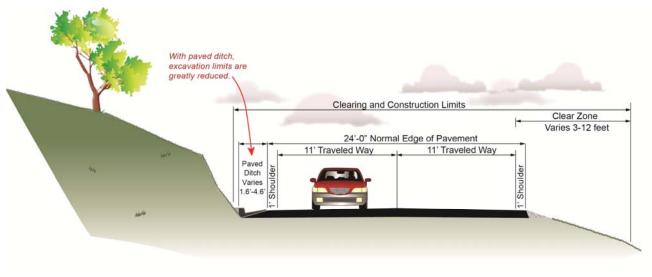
Typical Section at Steep Slopes with Paved Ditch (Proposed)
